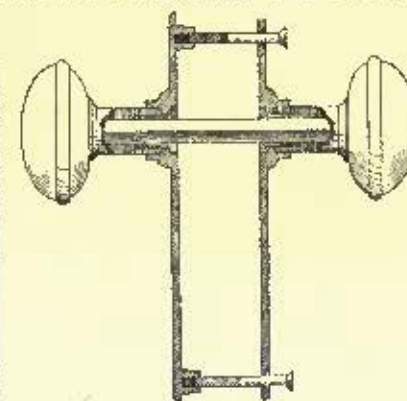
Knob with threaded Spindle. Standard Lock Mfg. Co.
